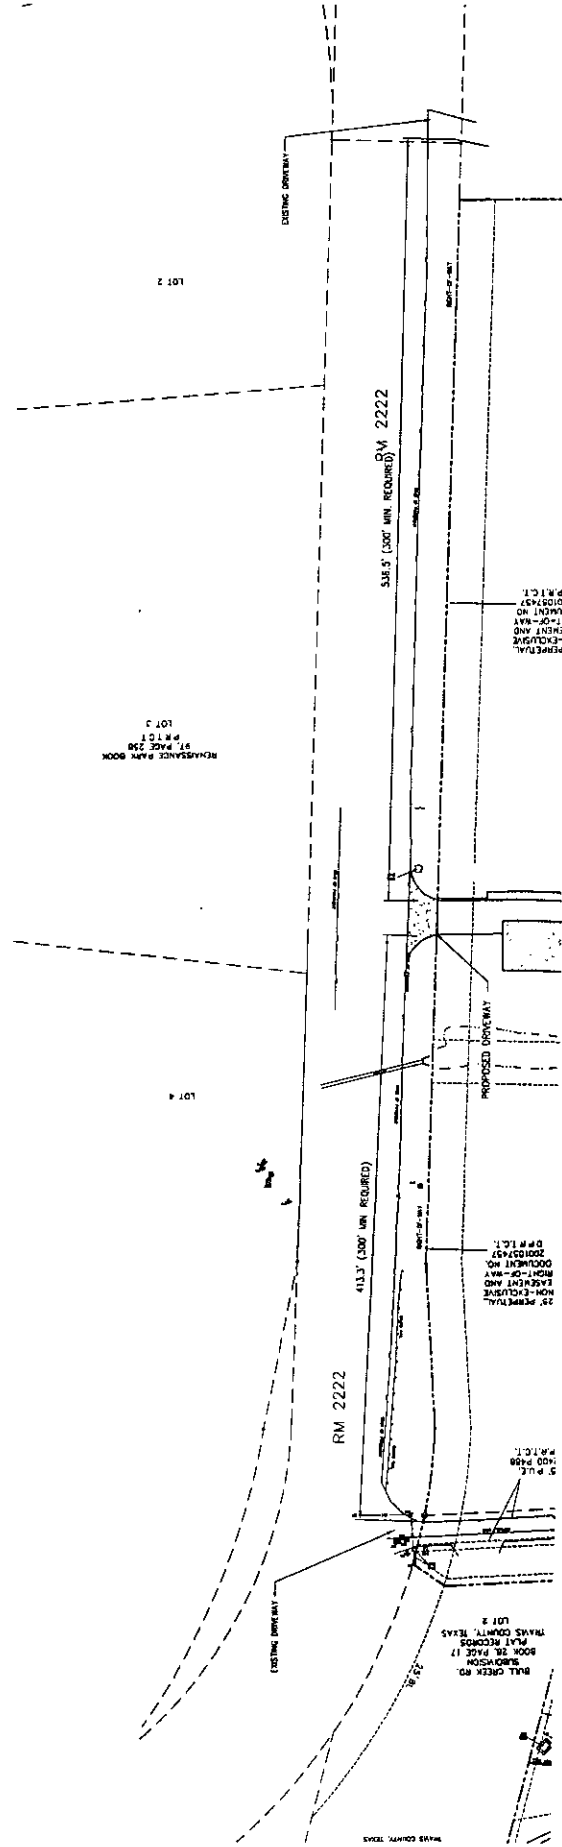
EXHIBIT M - DRIVEWAY DETAILS - (2 of 5)
